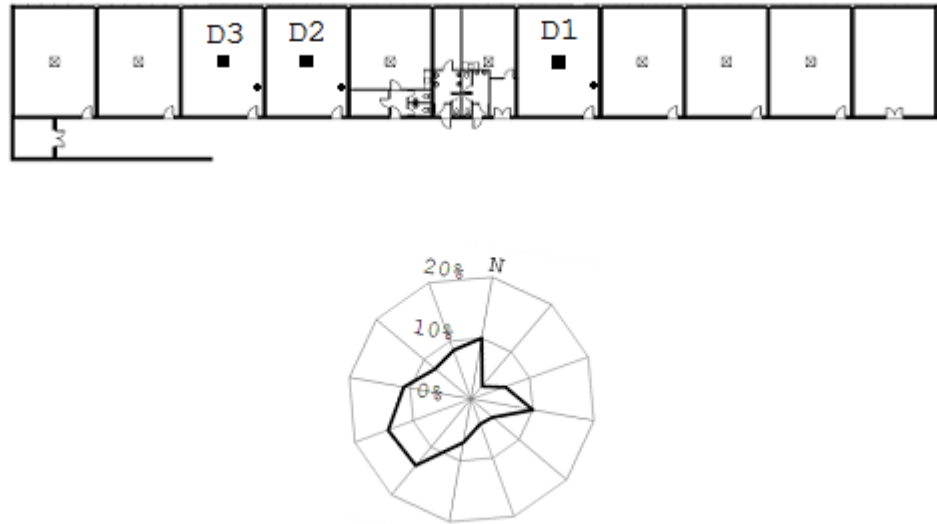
School D, plan view, ground floor. D1, D2, and D3, floor area 69.84 m².
